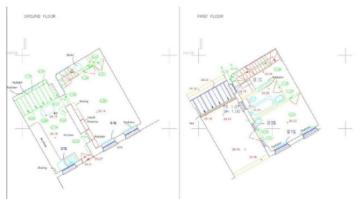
GROUND AND FIRST FLOOR OF 1A BONNY STREET — INTERNAL MEASURED SURVEY
